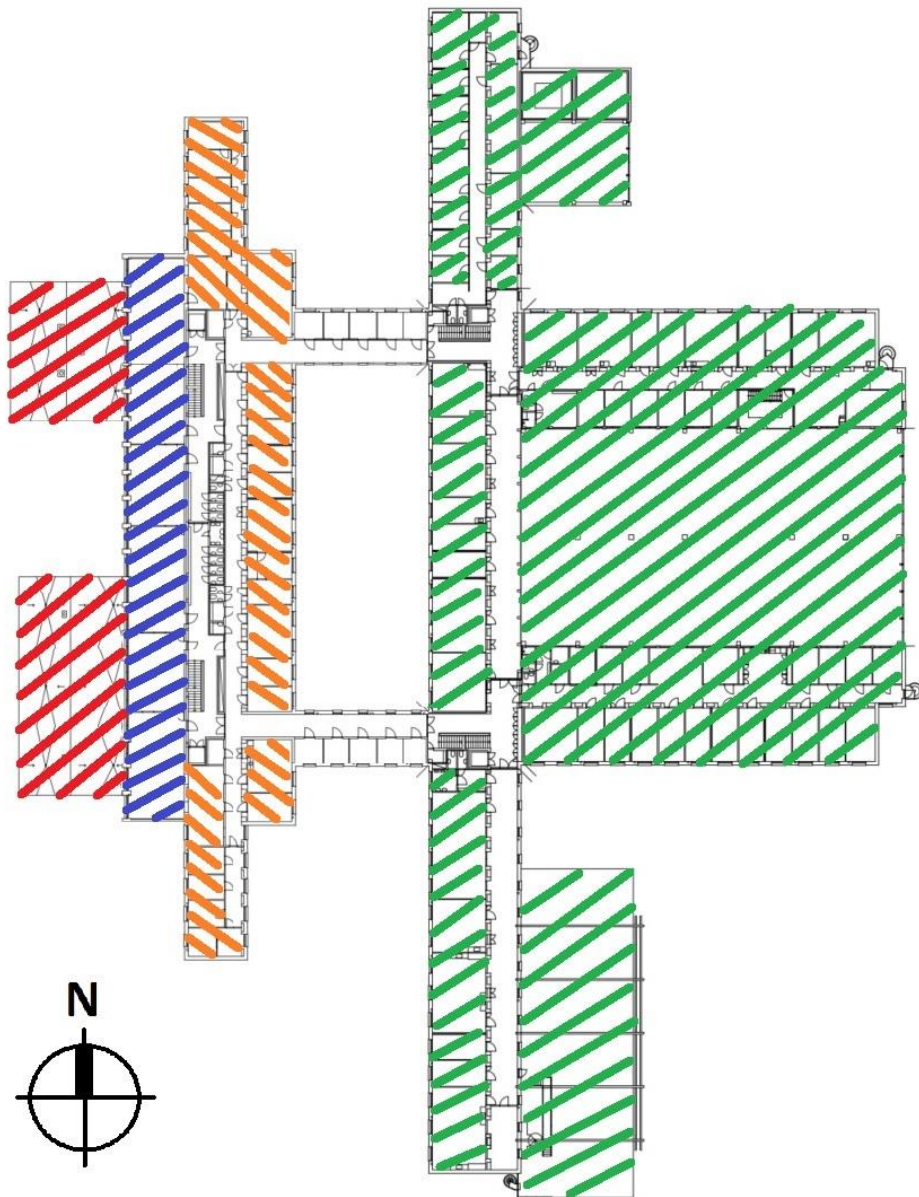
Floor plan showing the base principles of the layout (Illustration by the author)
